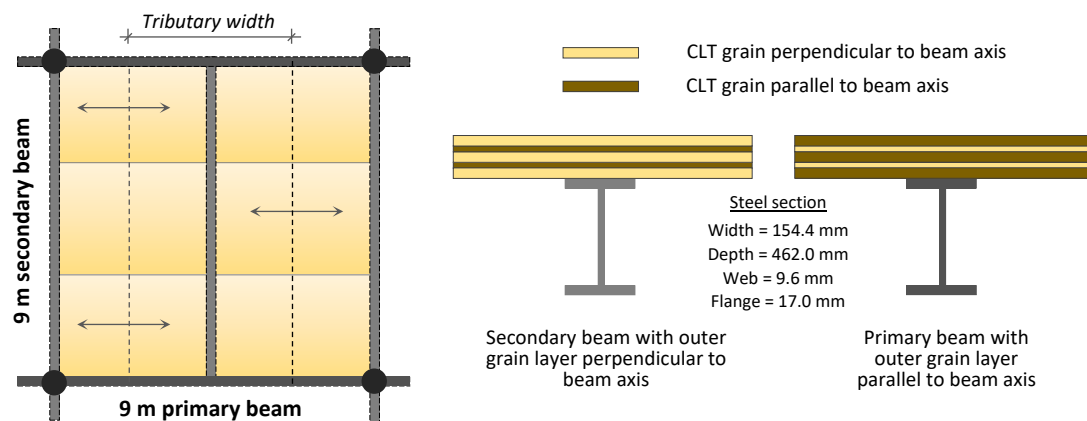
Typical office floor with $9\text{ m} \times 9\text{ m}$ column grid with beam arrangement and CLT panels orientation
